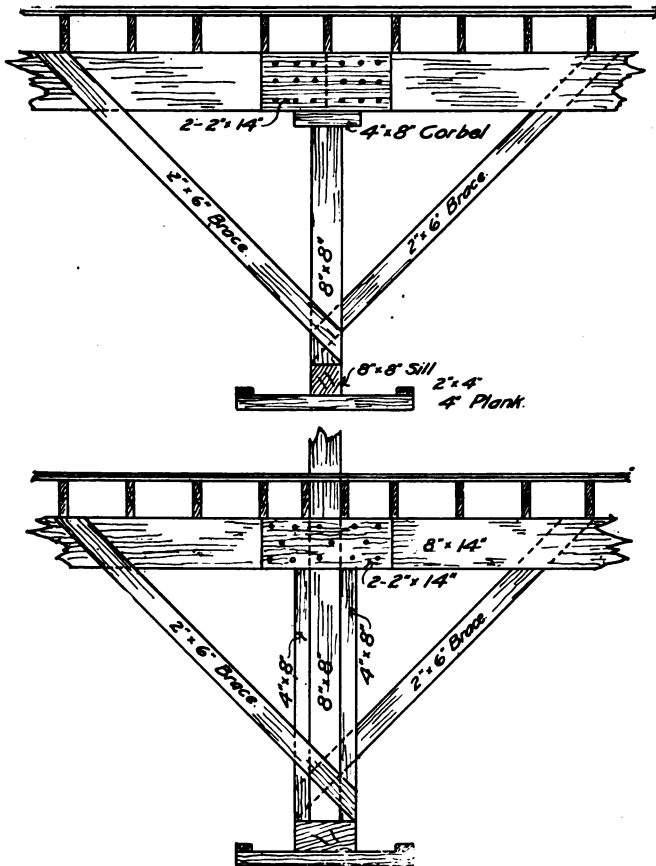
AND 90. CORRECT DESIGN FOR TIMBER FOOTINGS.
